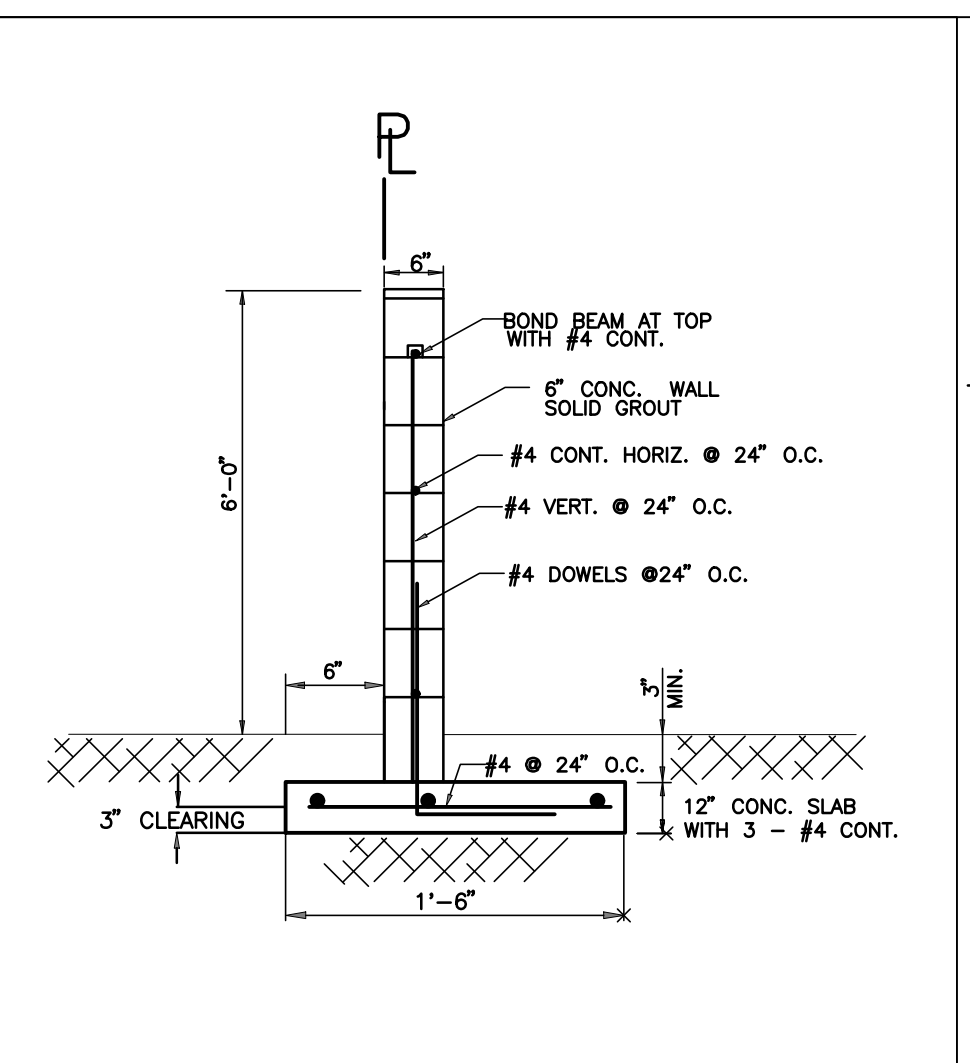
CORNER ON ATEN RD. AND LEGAKES AVE.
